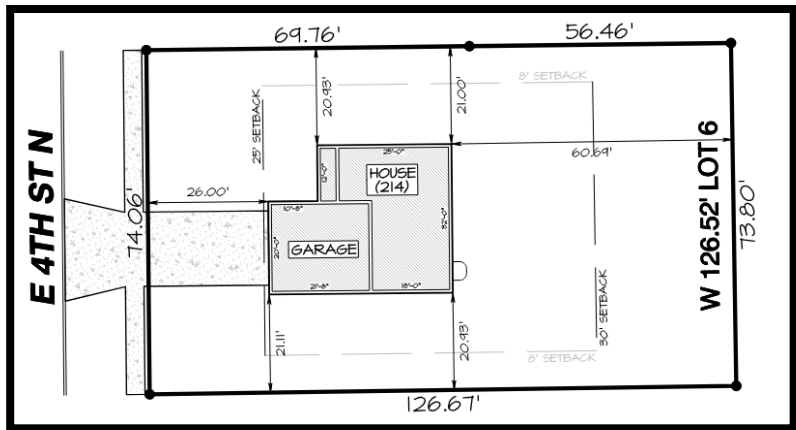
Site Plan for the lot behind 411 N. 3rd Ave. E. (214 E. 4th St. N.)
